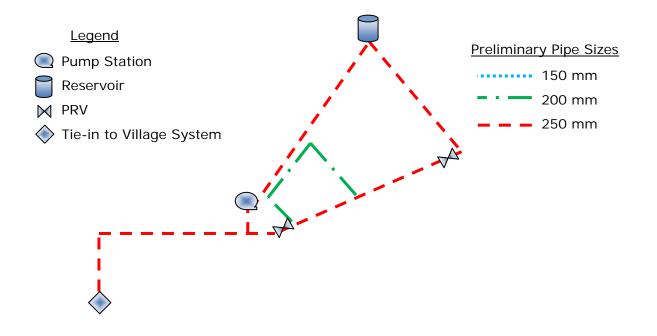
Servicing Arrangement 1-A (SRD Site Only, Fire Flow from Village)
